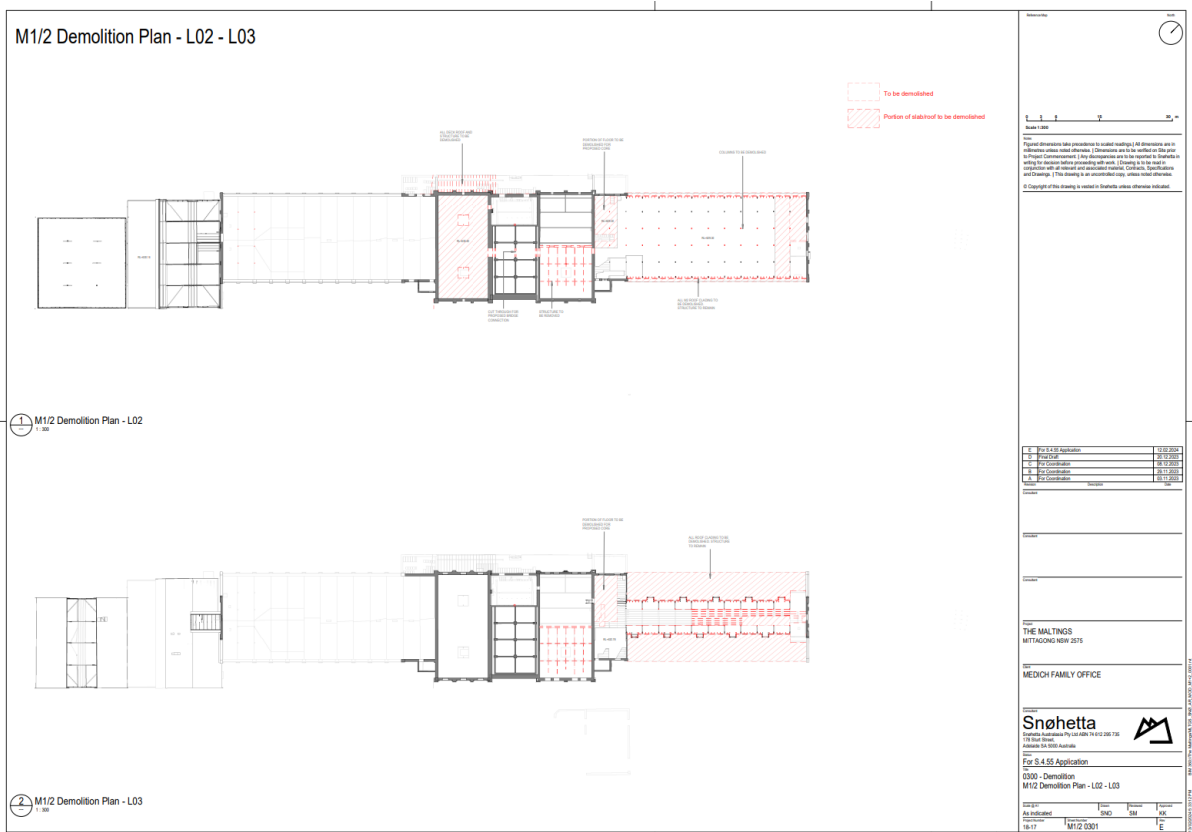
M1/2 Demolition Floor Plan (L02 – L03)
